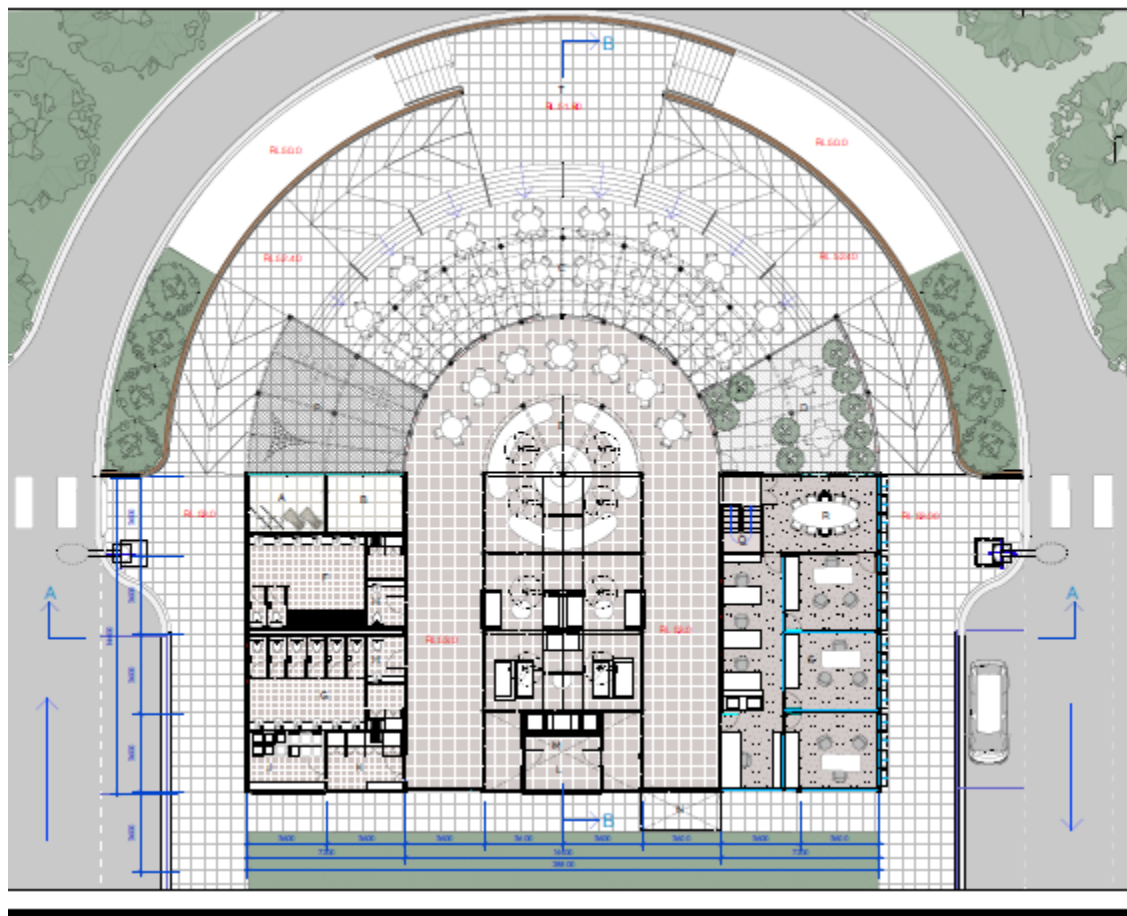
Stage 1A Community Centre – Floor Plan and Artist images.
